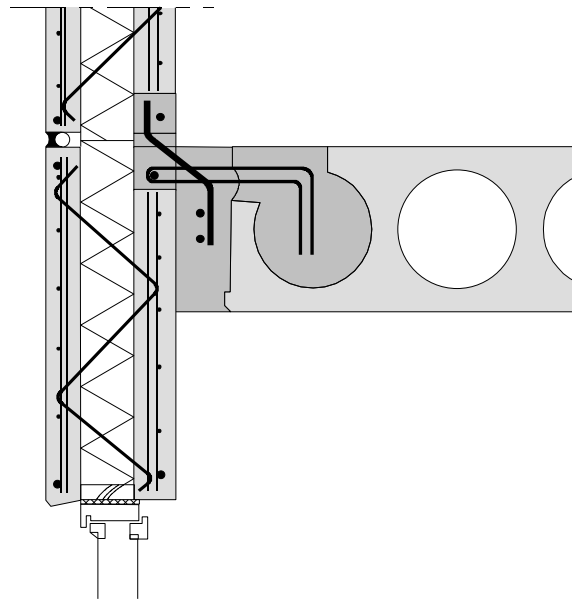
Cross-section of a typical concrete panel facade used in Finland (Pentti 1994).
